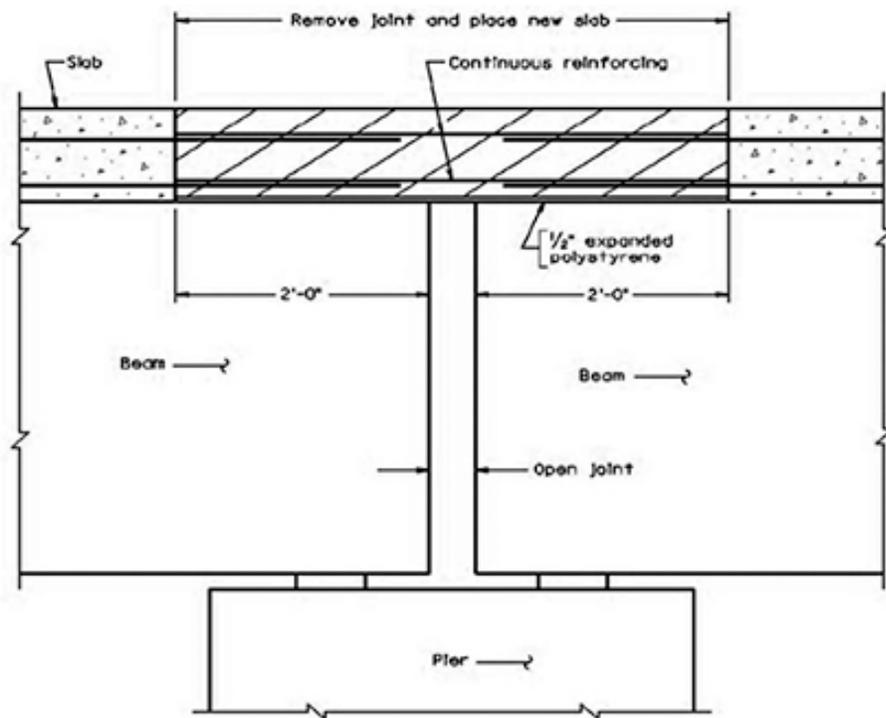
Detail for "Link Slab" Eliminating Joint over Pier
